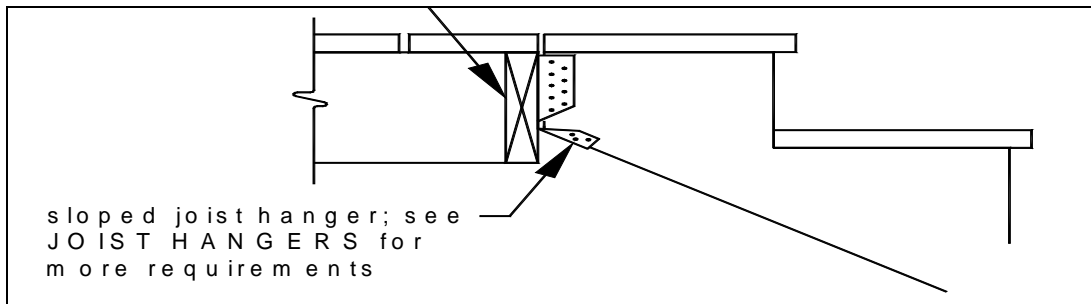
STAIR STRINGER ATTACHMENT DETAIL
